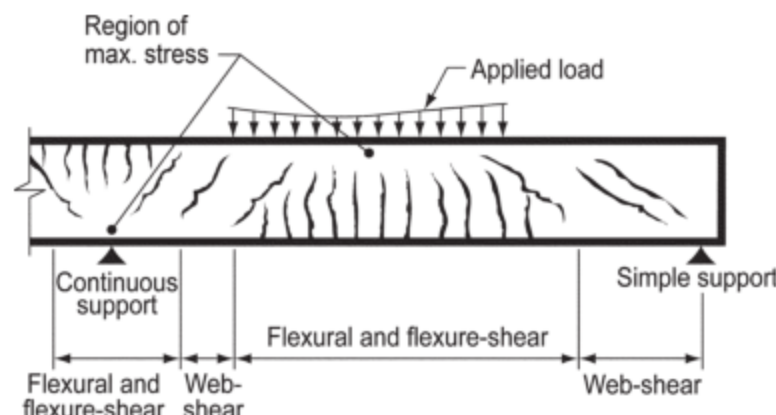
Types of cracking in concrete beams (Code Section R22.5.6.3).
